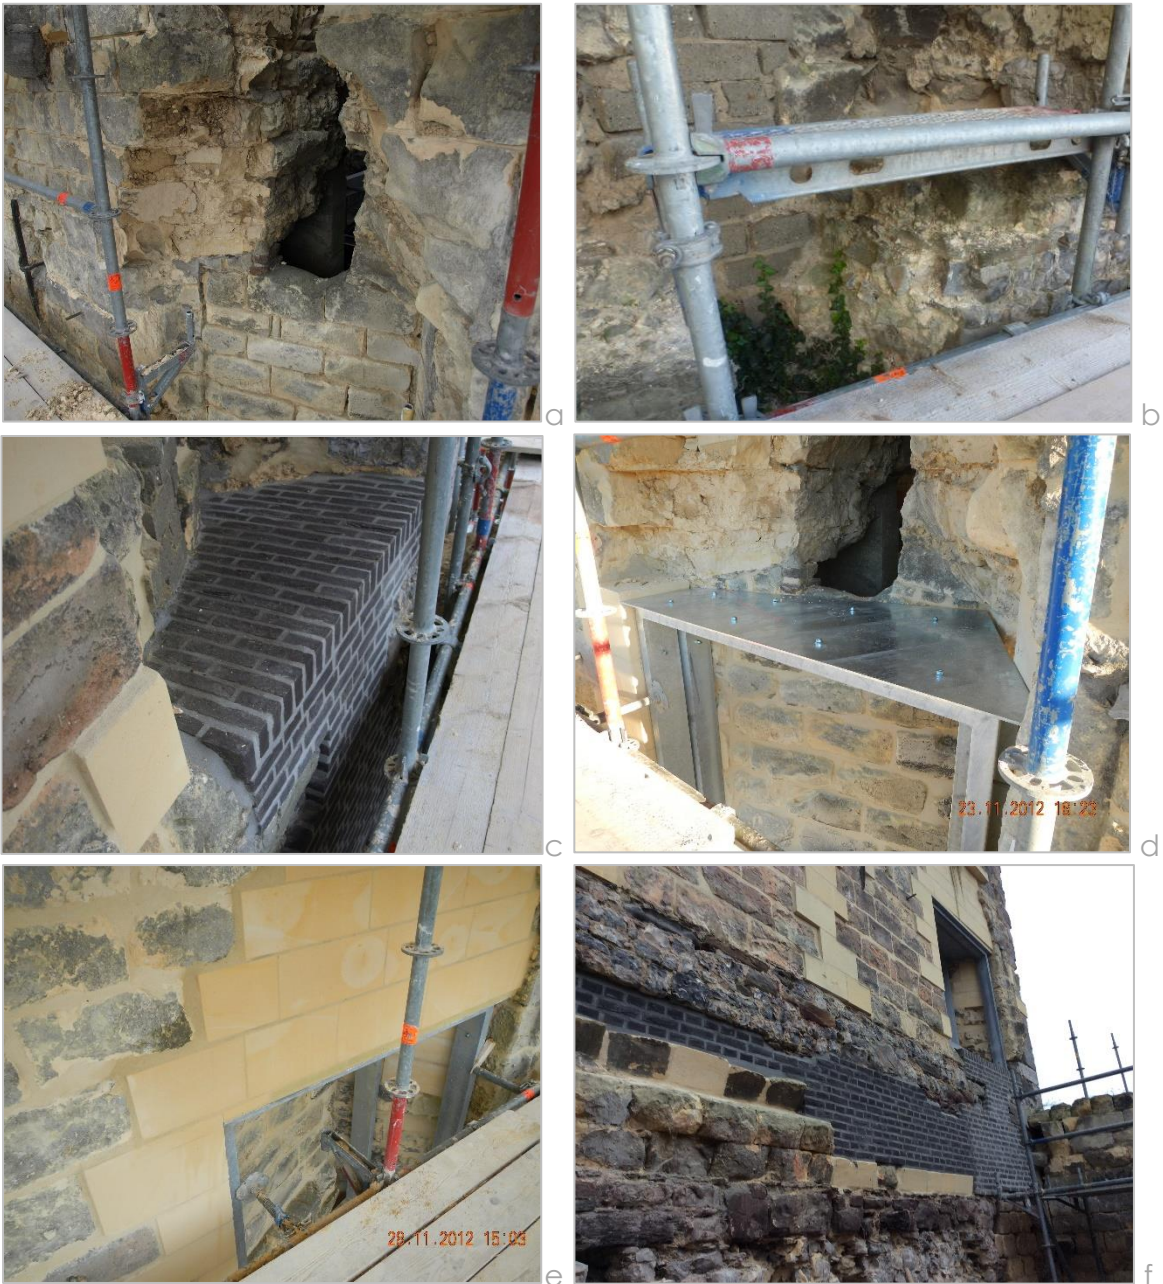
Restoration/consolidation works performed by Steunbeer bv: a) prior to intervention, limestone wall to replace; b) bottom of the limestone wall filling in the crack; c) masonry base for intervention; d) frame support system introduction; e) tissue replacement and addition; f) complete intervention applied. Reprinted with courtesy of Steunbeer bv.
